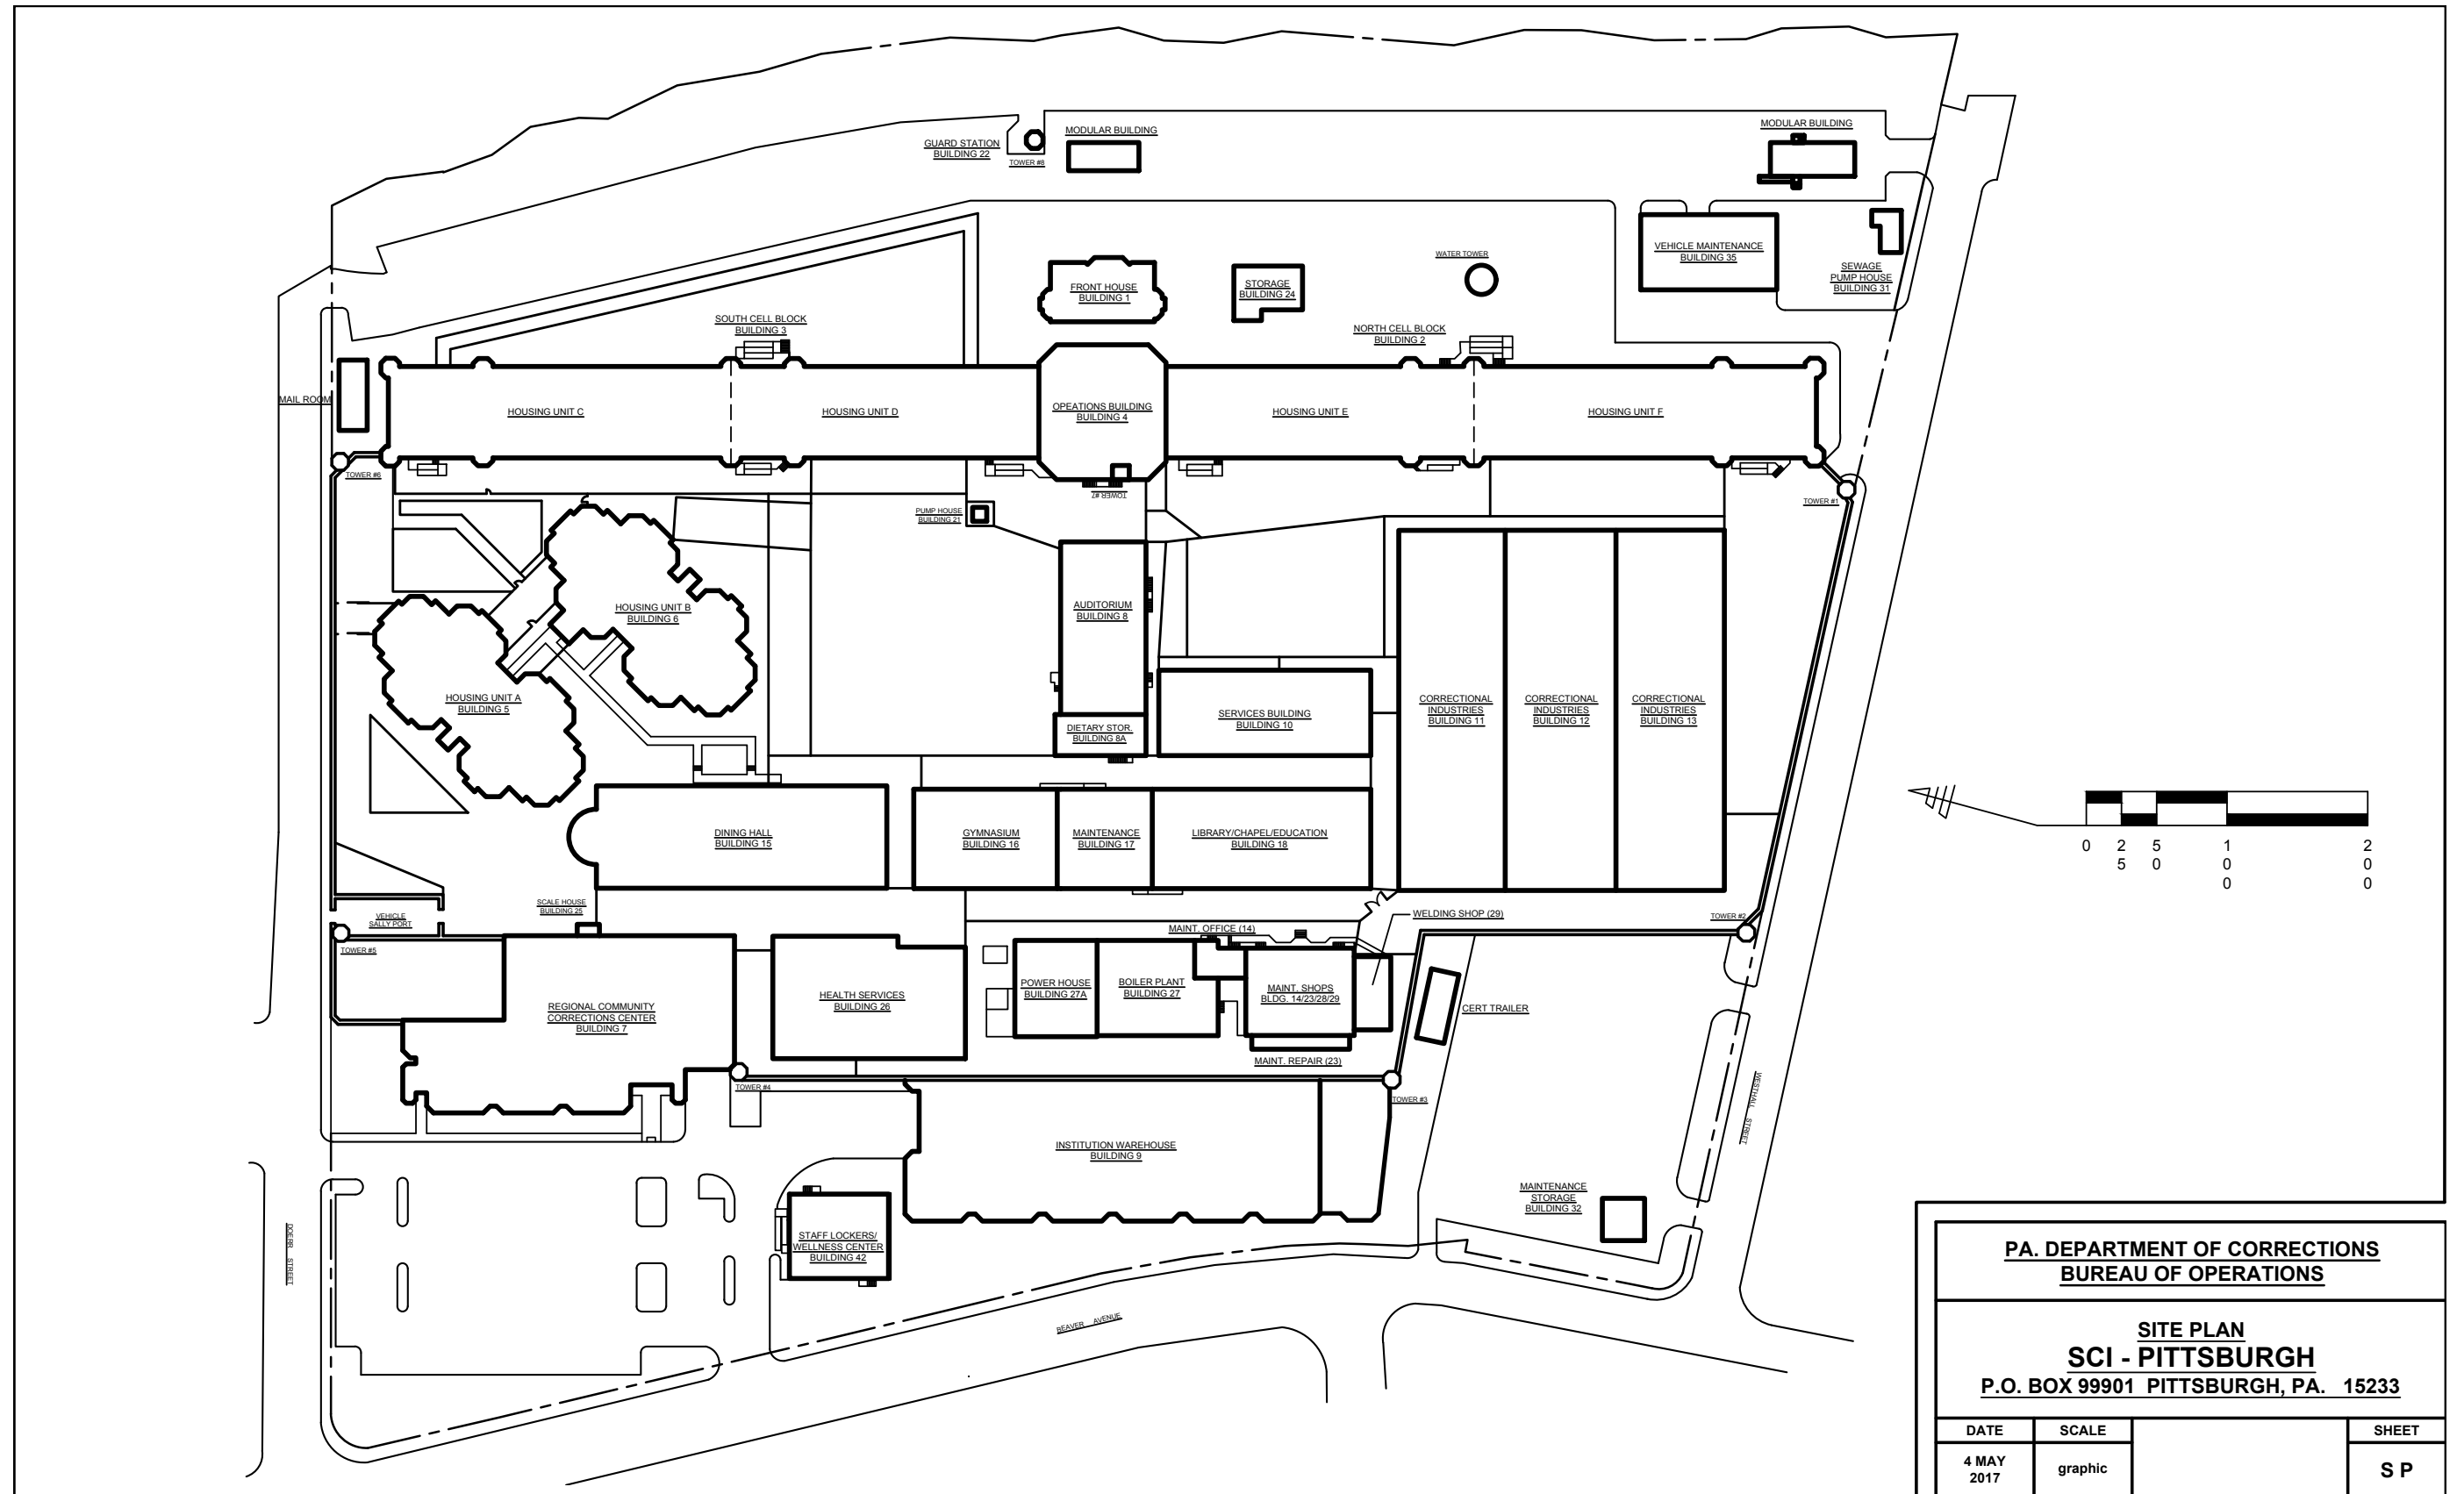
Site Plan of SCI-Pittsburgh (PA Department of Corrections)
